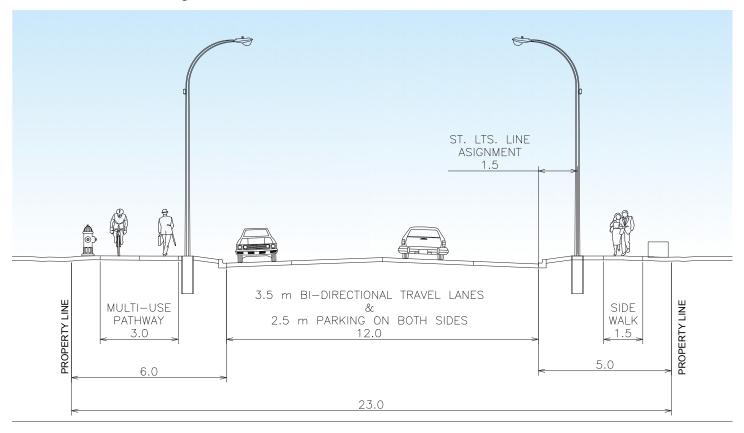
Conceptual Road Cross Section Southgate Boulevard and Fairmont Gate
